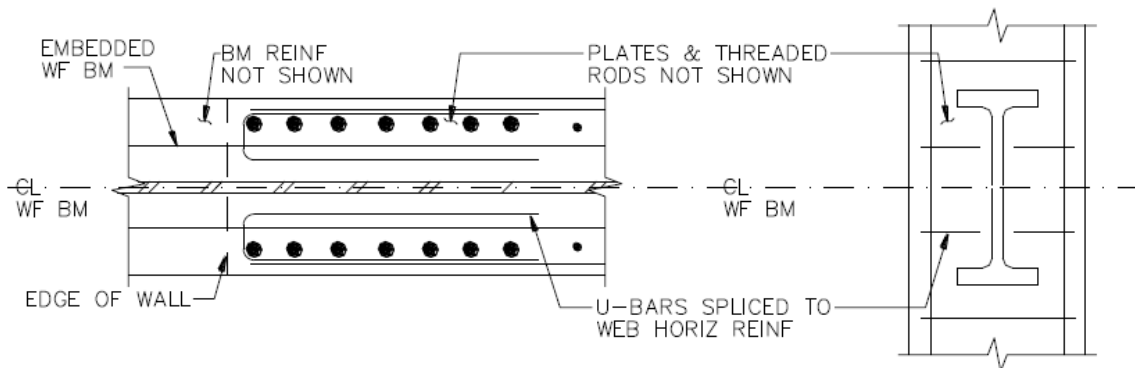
U-Bars Spliced to Web Horizontal Reinforcement at Embedded Steel Section
